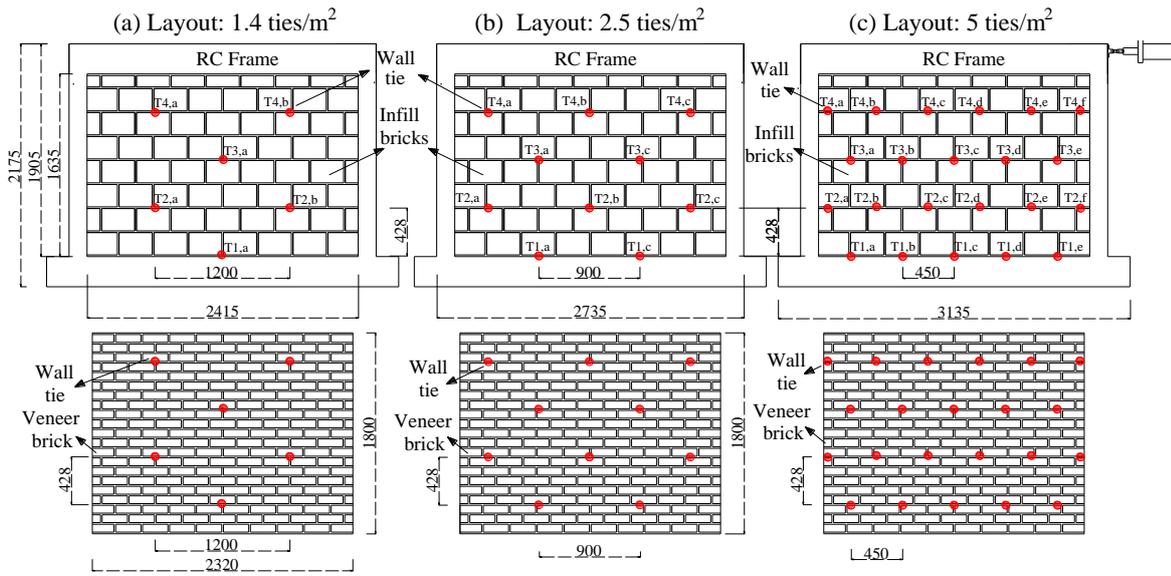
| Layout of wall ties on masonry infill and veneer wythes (dimensions in millimetres)
